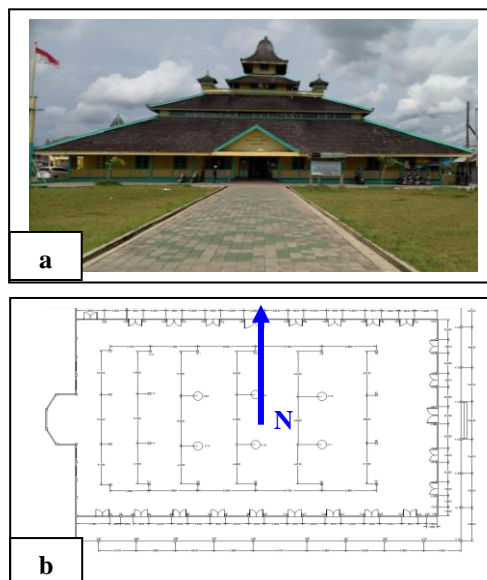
(a) Jami Mosque's front view (b) Building plan with north (N) direction
